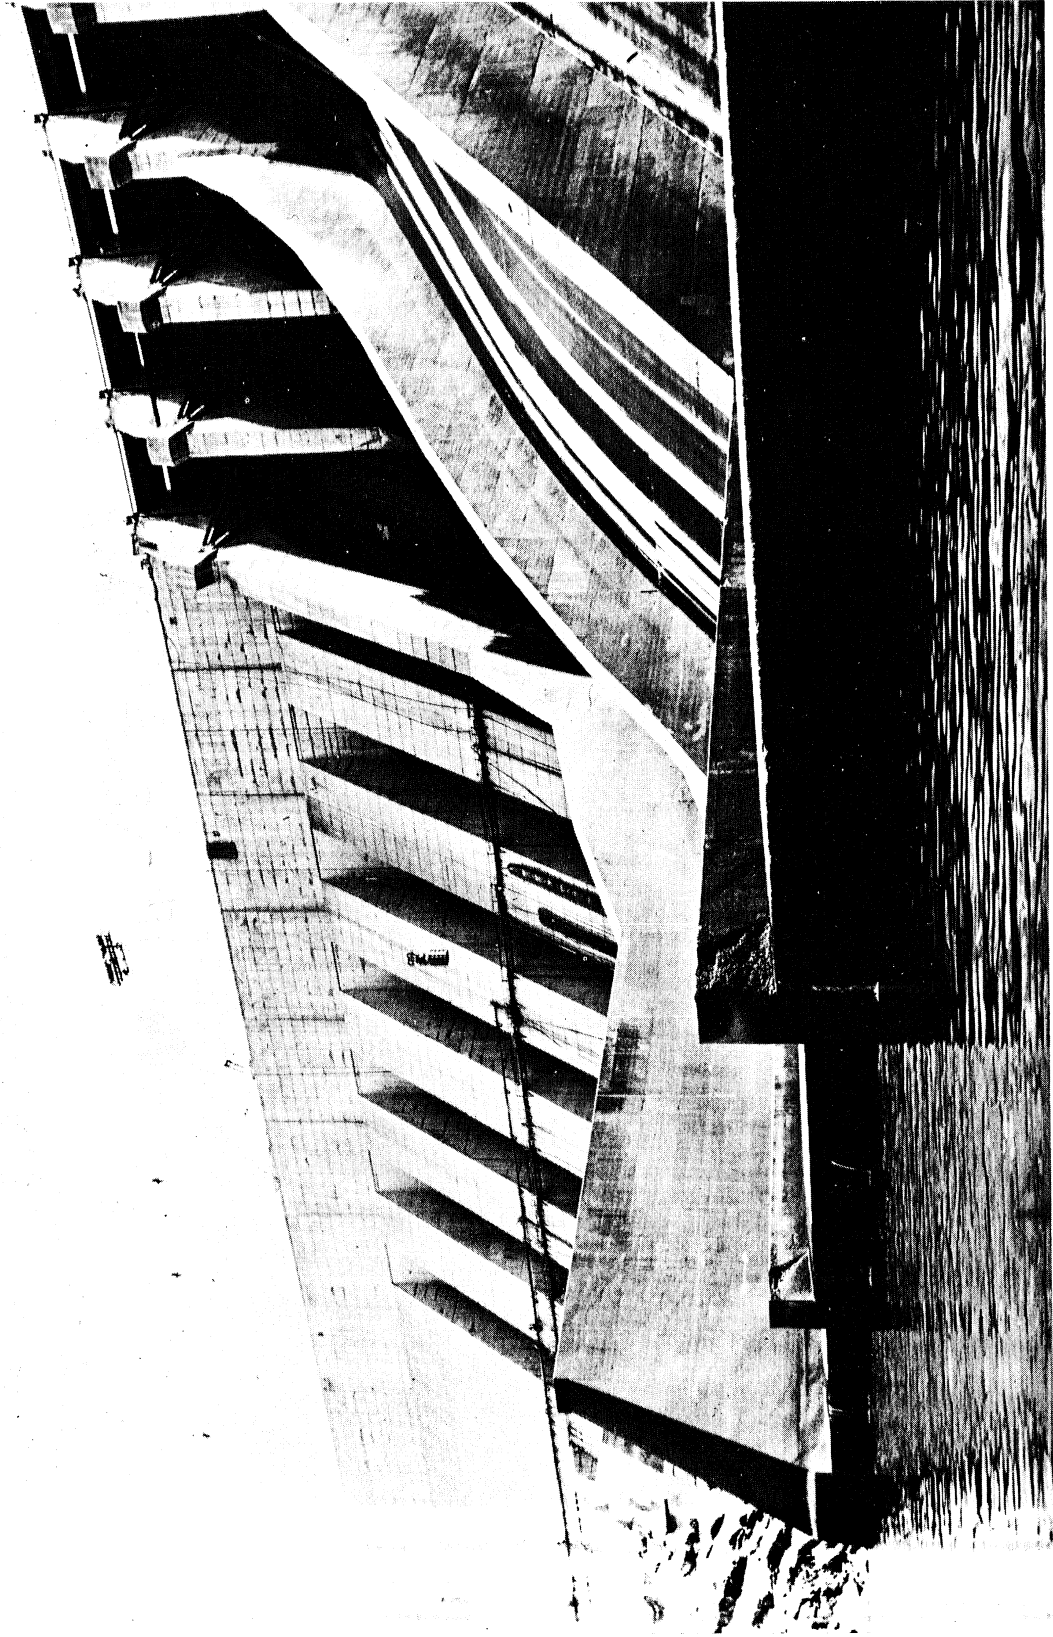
Downstream View of the Spillway Sill showing Erosive Damage on the Training Walls (Harza Engineering Co.)
